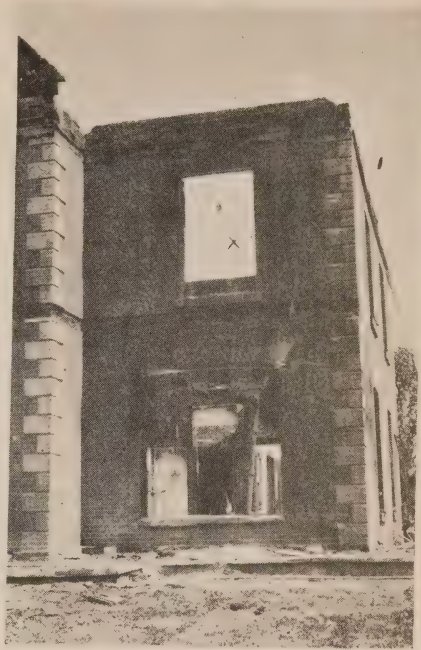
North-west corner of building: part gutted by fire, showing roof burned off and water pipe remaining standing inside building.
